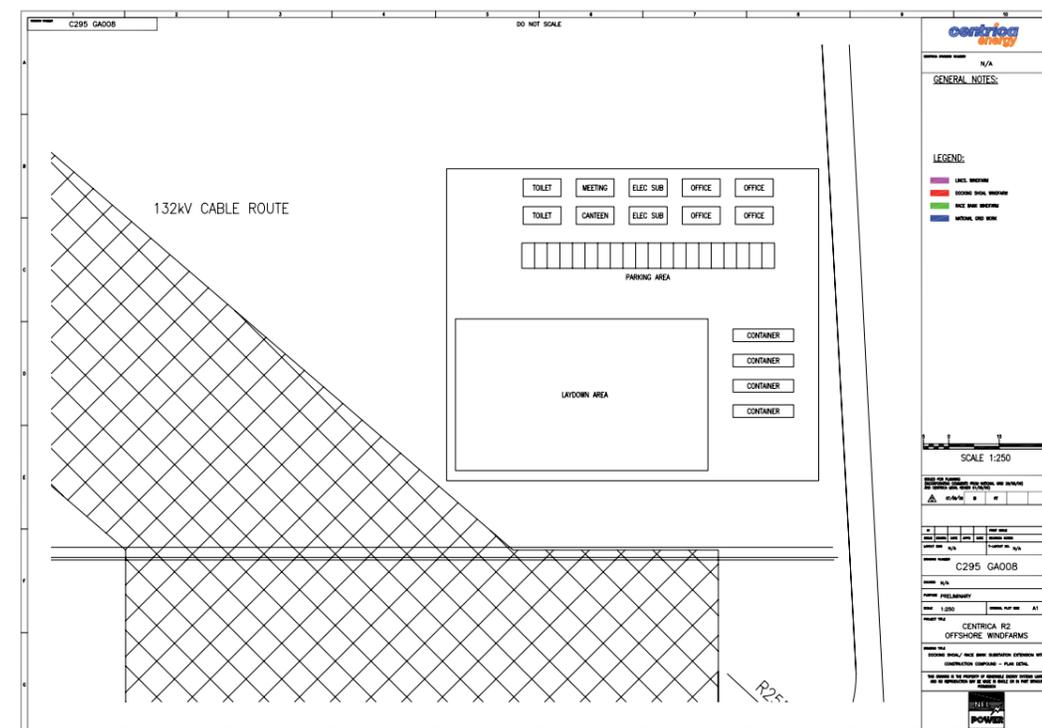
| Details of Docking Shoal and Race Bank construction compound
